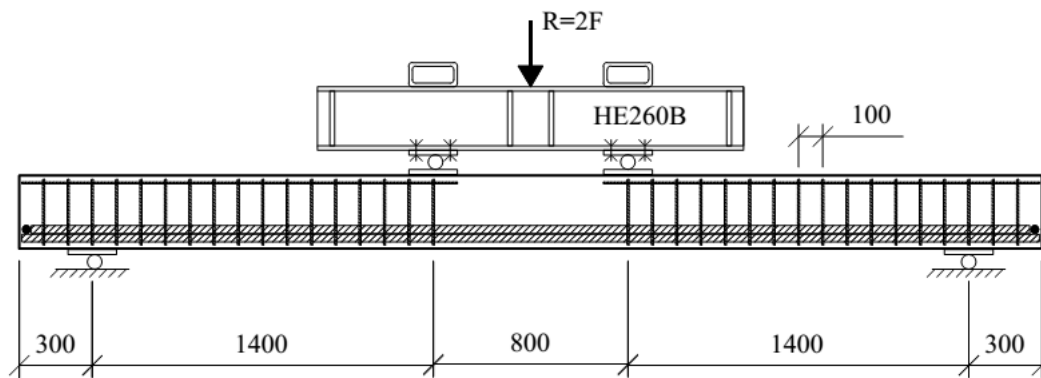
Loading arrangement, reinforcement layout and dimensions (in mm)
